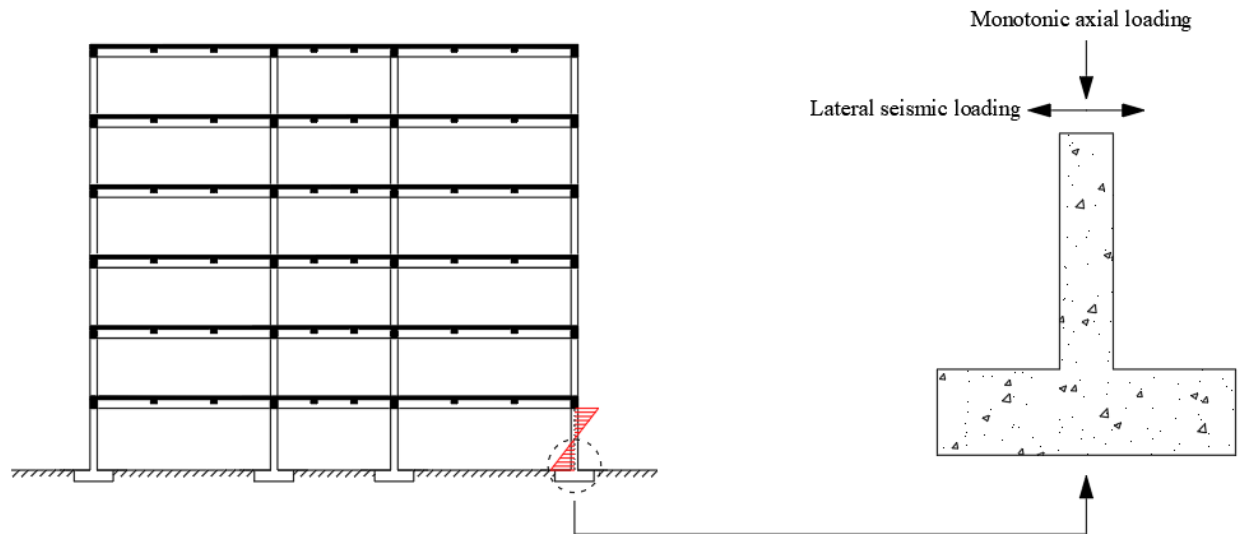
Sectional elevation of the prototype structure and the isolated specimen
